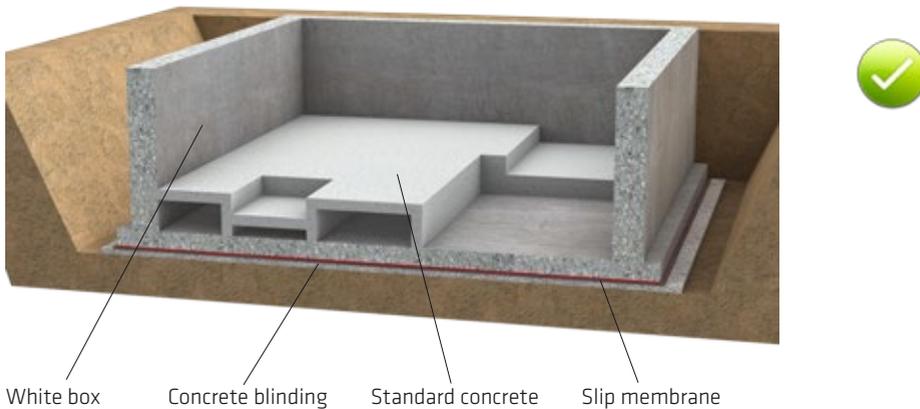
An appropriate design for the Sika White Box Concept: a simple shape, uniform floor and wall thickness, no offsets
